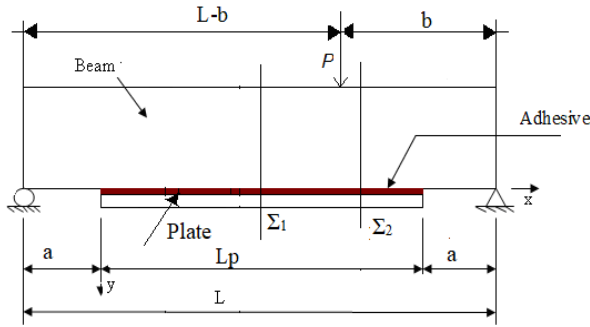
Simply supported beam bonded with a soffit plate under a point load
